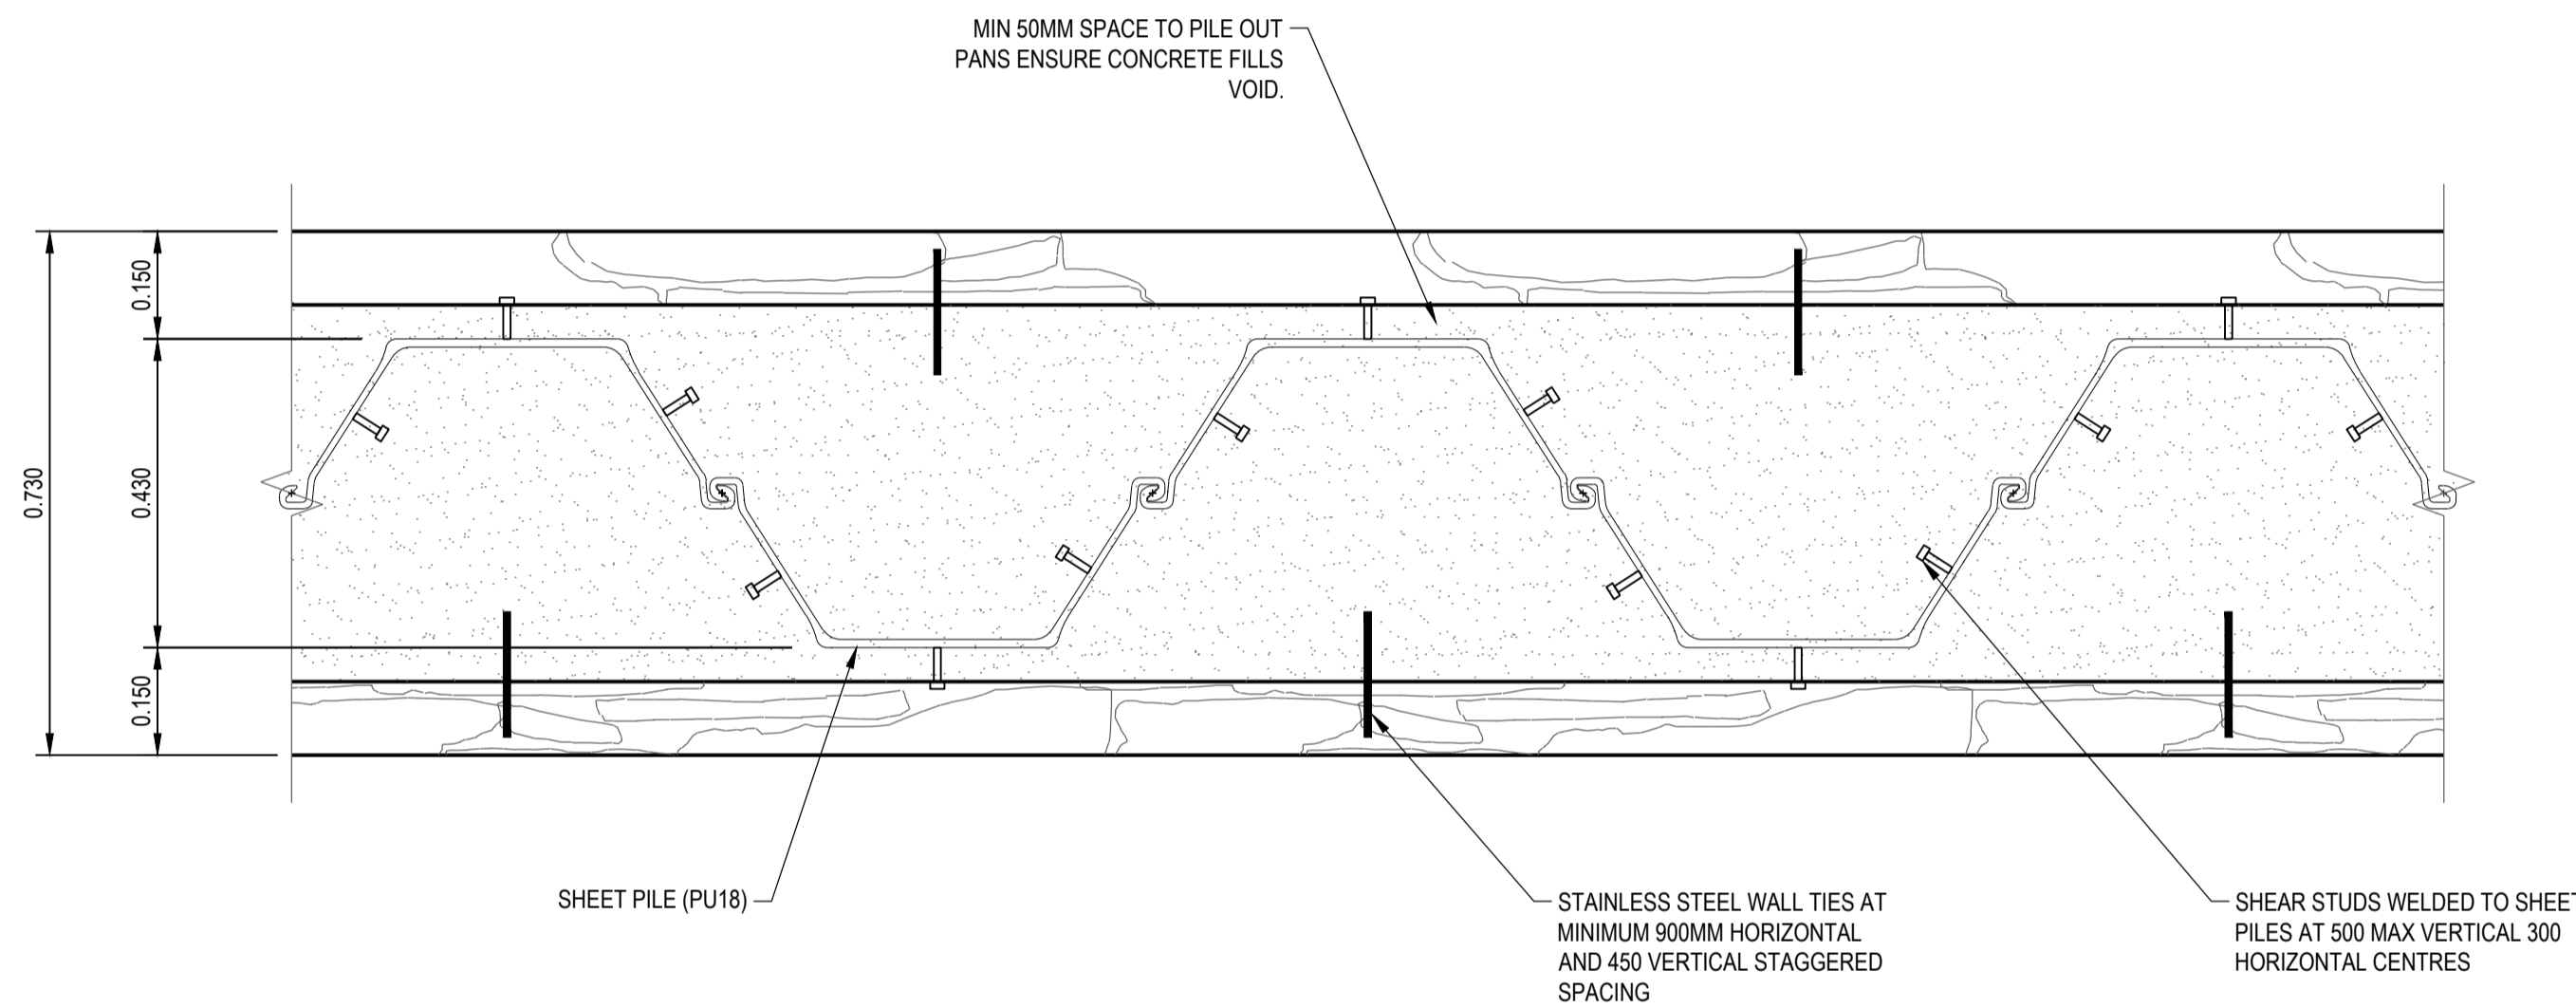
BUK-ZZ-00-DR-C-05100 Revision P02
